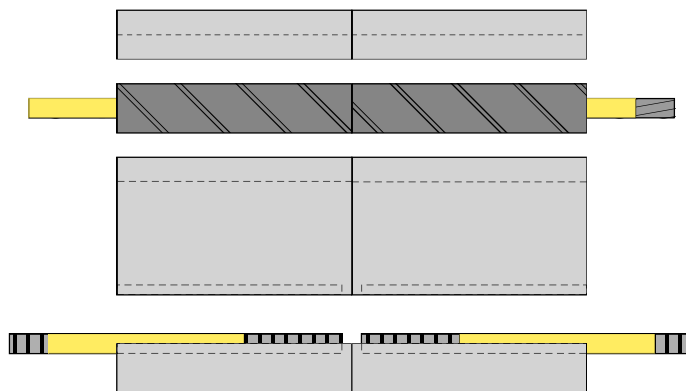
Specimen Opened to Expose Mild Steel Bars ^{3.8}
